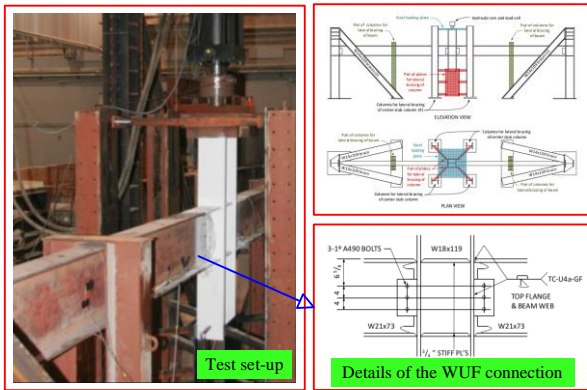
Collapse tests of beam-column assemblies with WUF connection [26] (dimension units: in)
